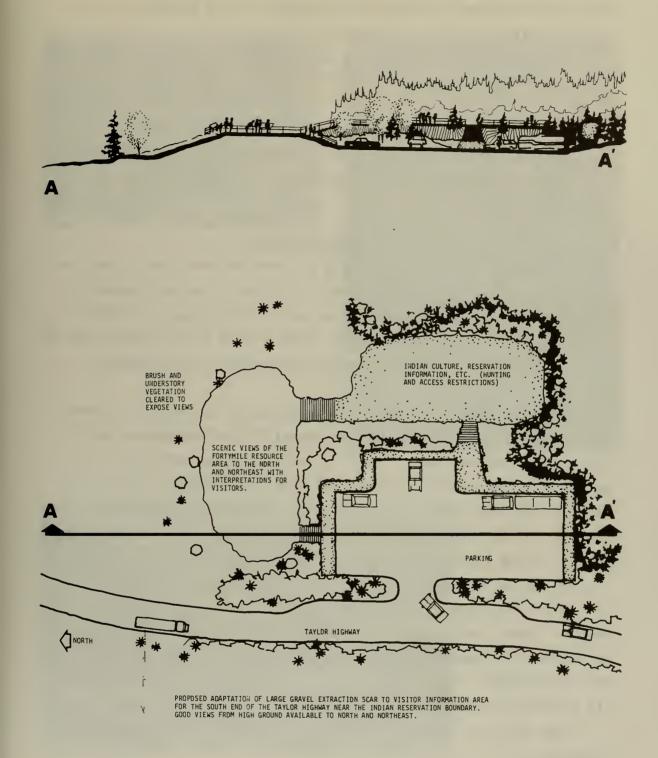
SOUTH TAYLOR HIGHWAY INFORMATION AREA SKETCH PLAN
